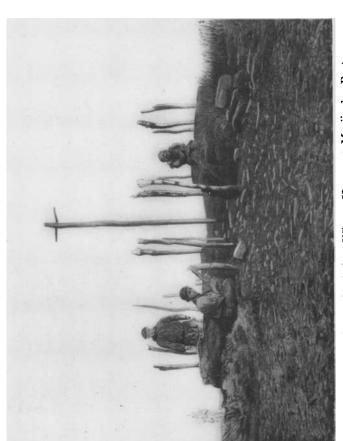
Constructing a Chukchee Winter House at Mariinsky Post.
